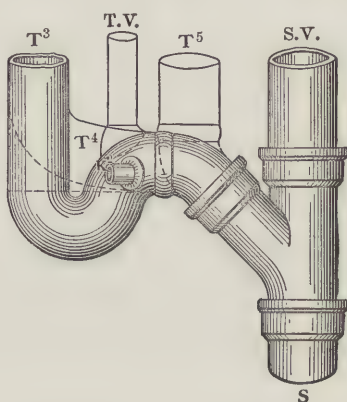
LEAD TRAP CLOSET AND HOPPER BRANCHES WITH BRANCH FOR BATH, ETC., ENTERED INTO LEAD TRAP ON SEWER SIDE OF SEAL
